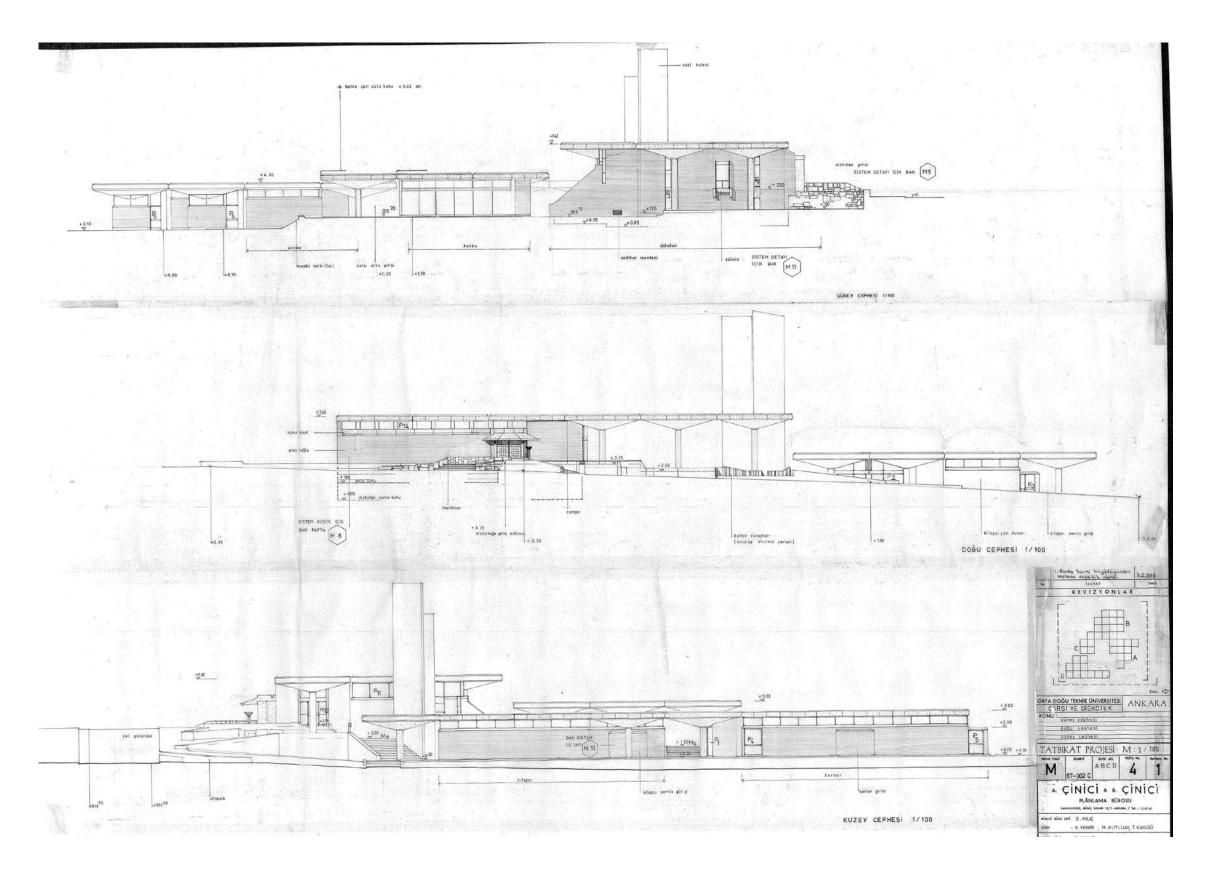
Original Drawing; South-East-North Facades Source: METU Directorate of Construction & Technical Works
